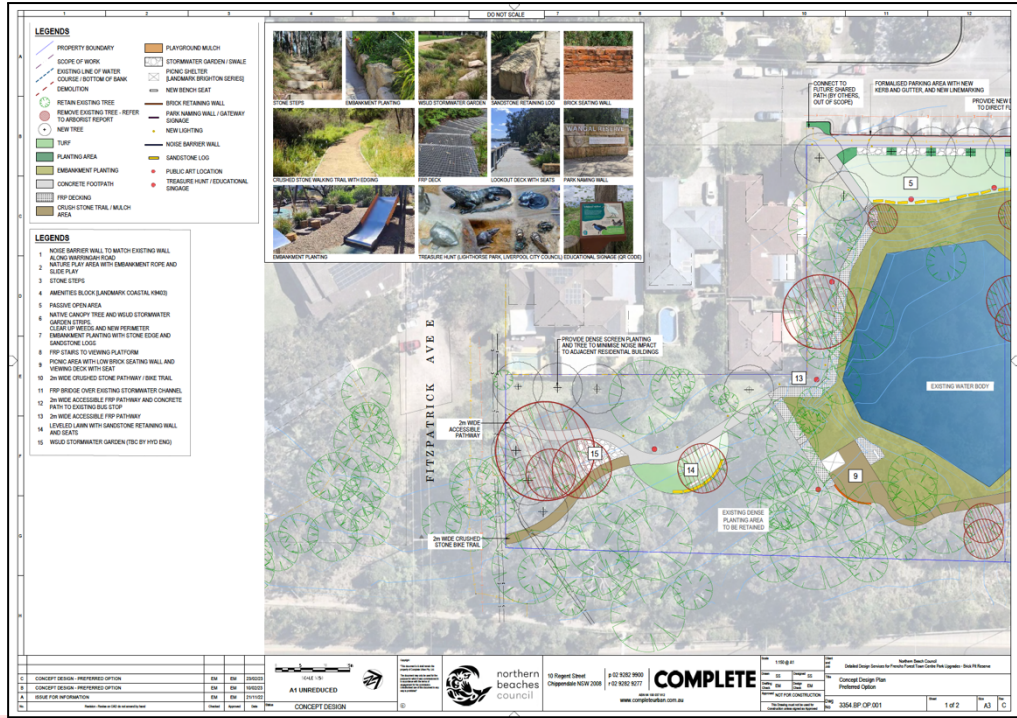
Sheet 1 of 2 showing the proposed concept design.
